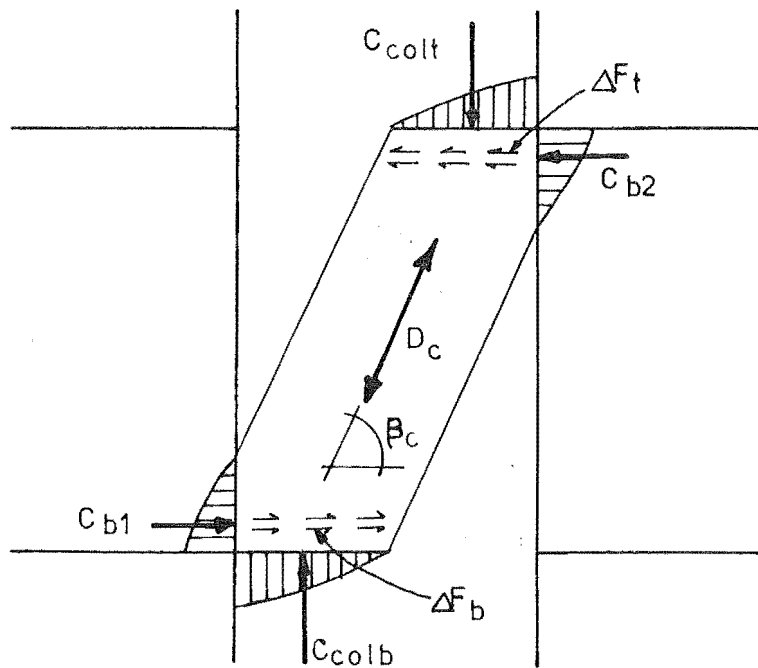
CONCRETE DIRECT STRUT MECHANISM
